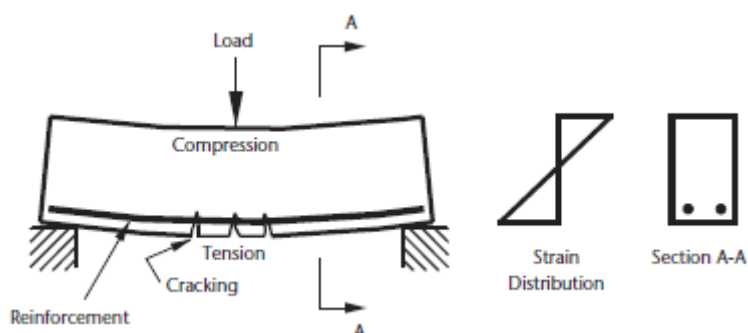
Reaction of reinforced concrete beam member due to loading
